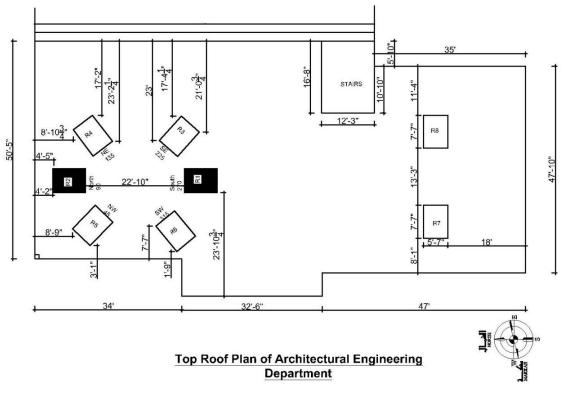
Schematic Layout of Experimental Models on Top Roof of Architectural Engineering and Design Department, UET Lahore.
